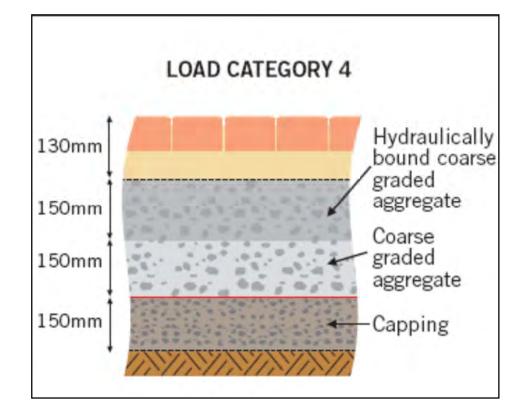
Section through a permeable surface for expected load category (Source: Interpave Permeable pavements – guide to the design construction and maintenance of concrete block permeable pavements dated 2010)
